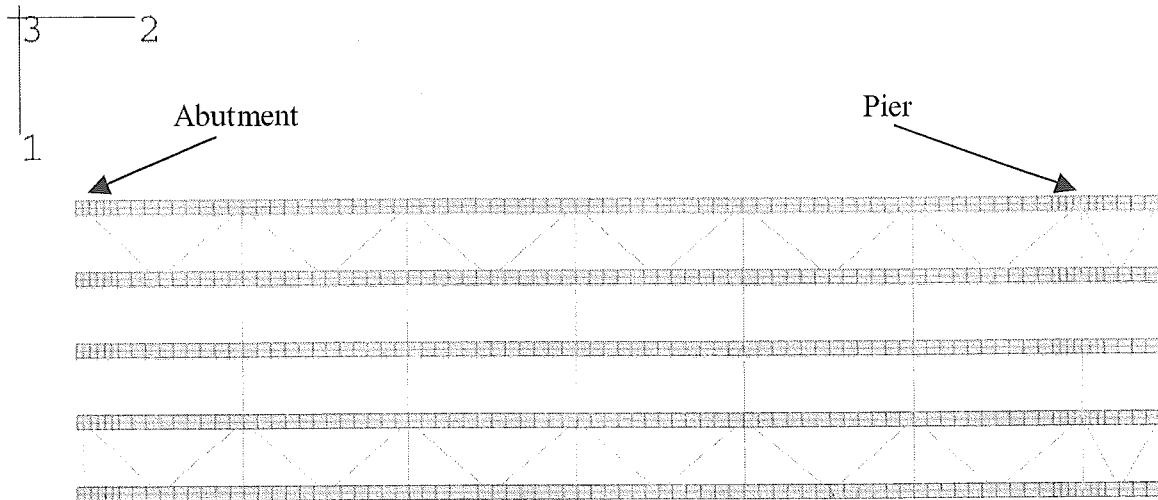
Top view of the girders with cross frames and cross bracing.
